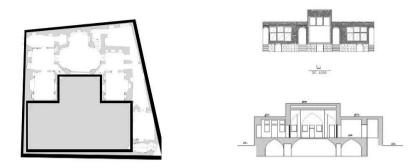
Plan of Seyed Hashem Ebrahimi House
